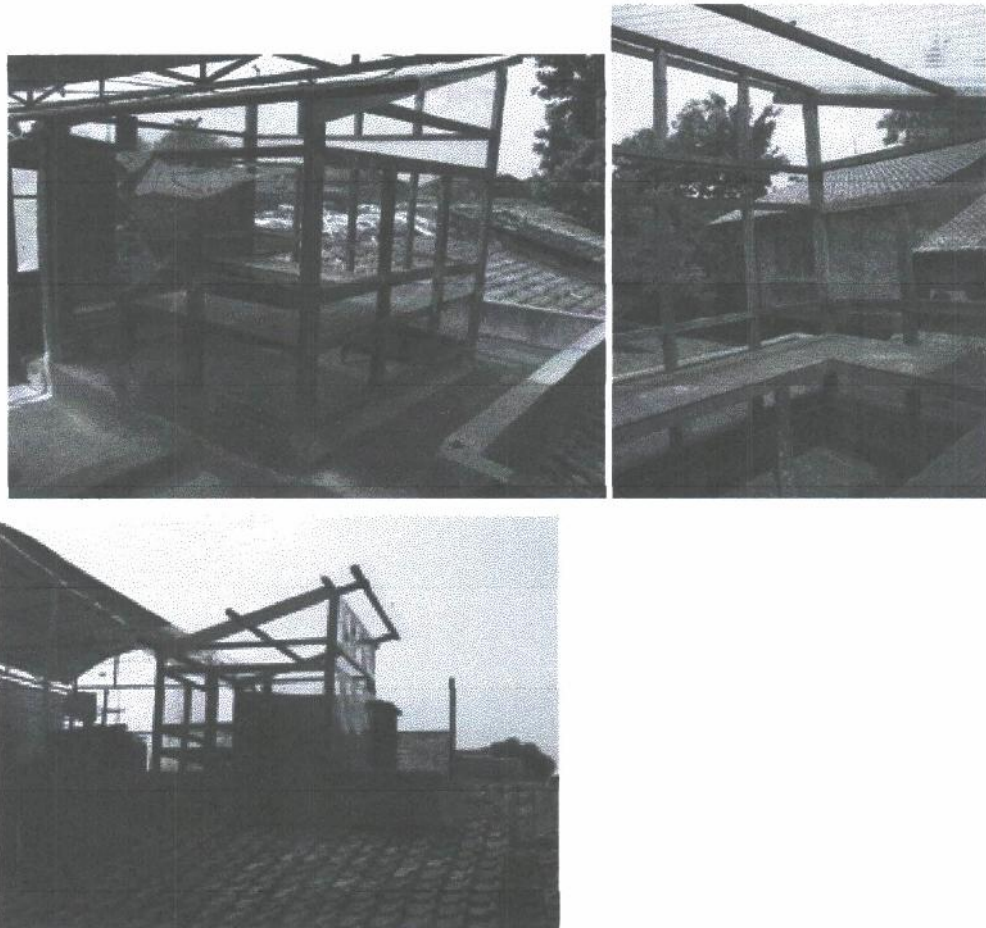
Triaxial sample drying room made by transparent wall and roof
